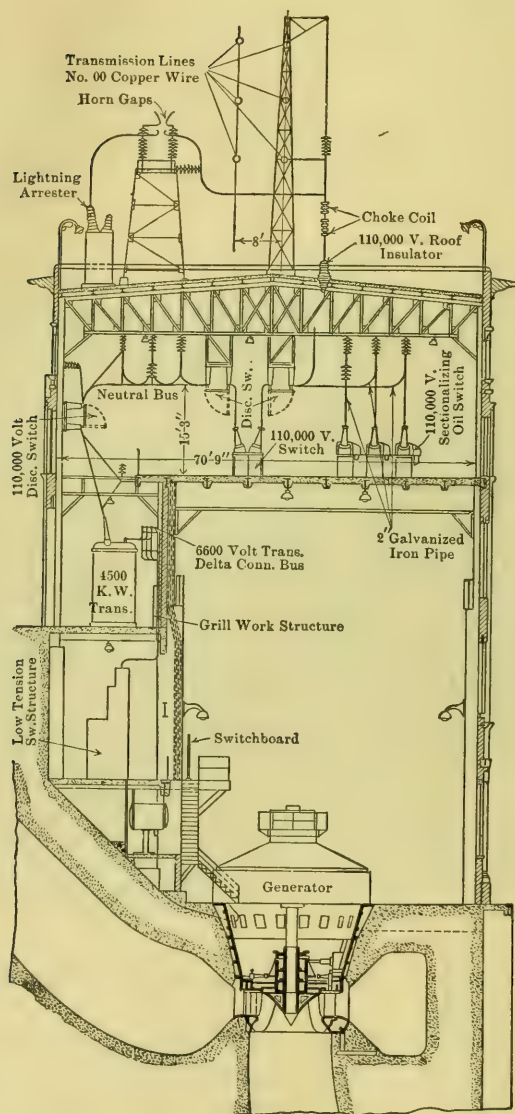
Power-house Arrangement. Alabama Traction, Light and Power Company. Lock No. 12 Development.
